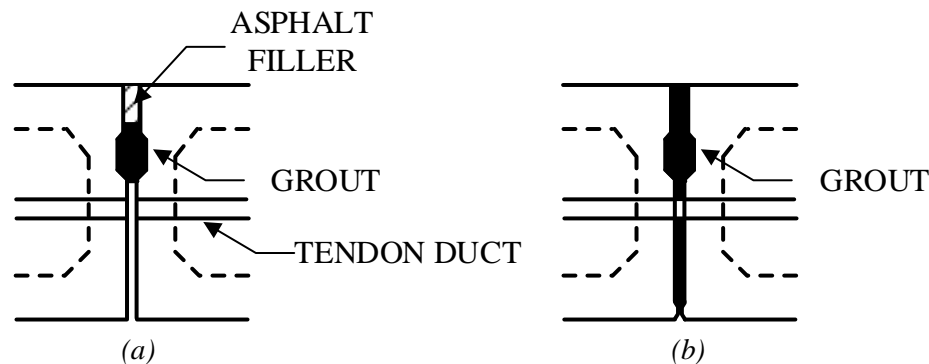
NYSDOT transverse connection details (a) before 1992 and (b) after 1992.
